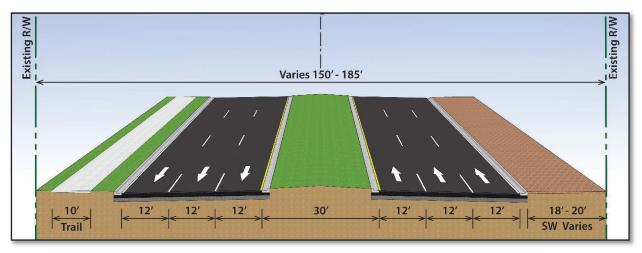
Existing Typical Section - Meridian Avenue - Cumberland Street to Kennedy Boulevard
